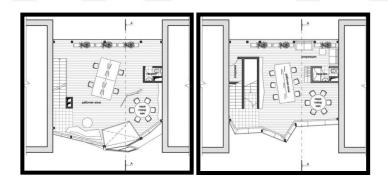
and Figure 2.83. Plans of Hanging Parasite Office [79]
